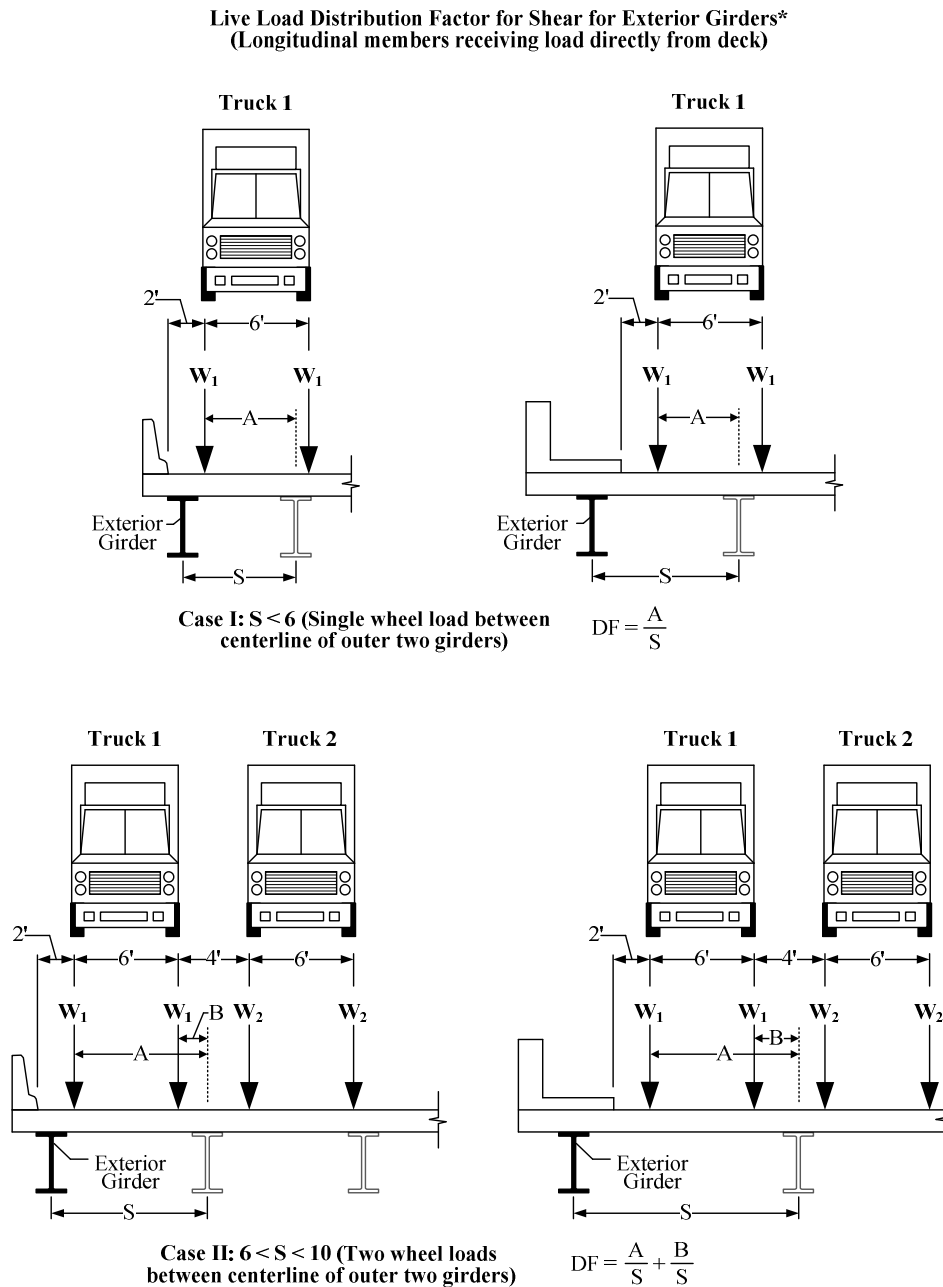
EXTERIOR GIRDER EXAMPLE FOR LEVER RULE
